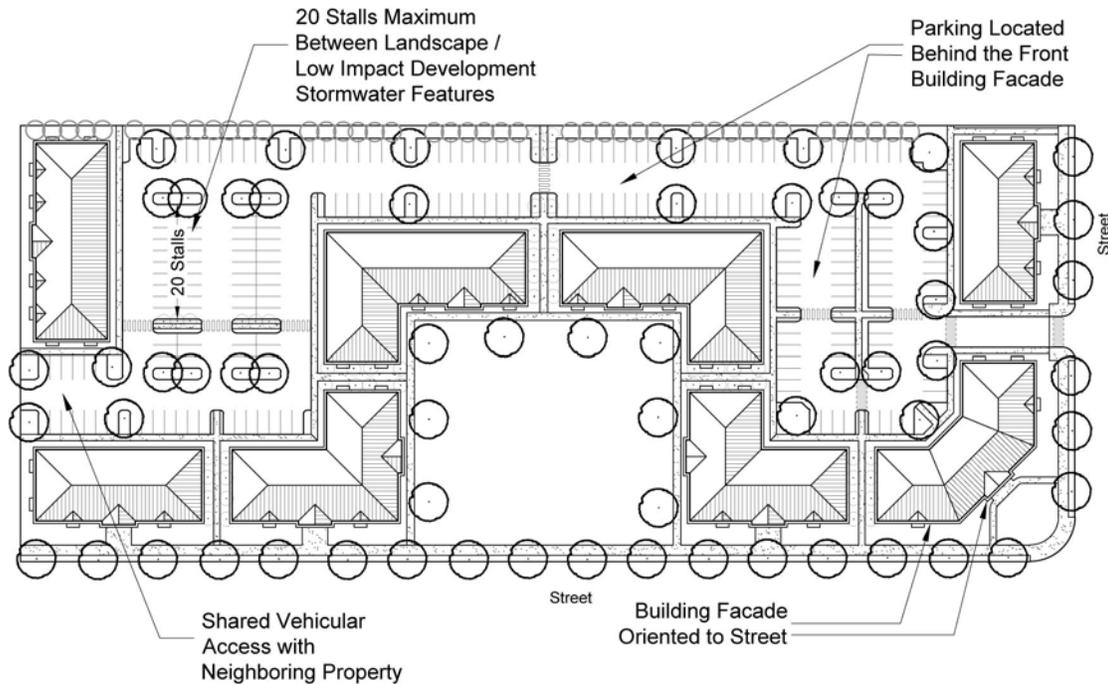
(d),3- Site Layout – Parking Lot Standards
